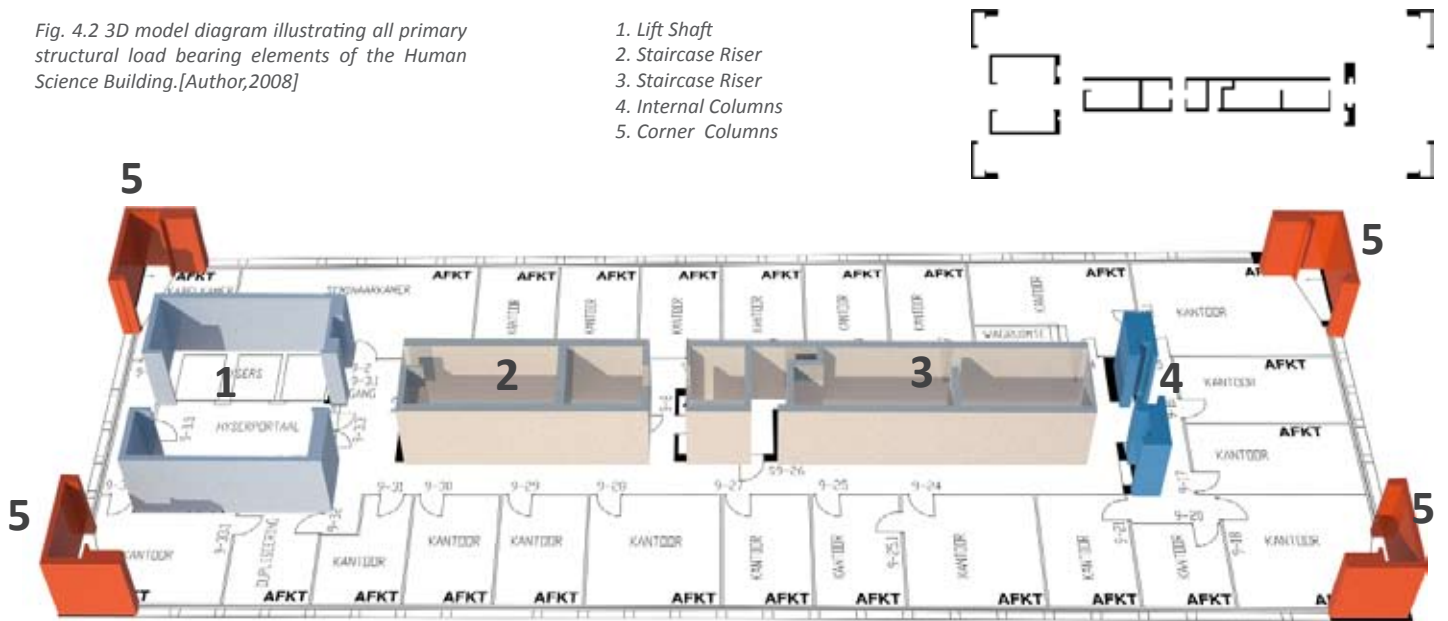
3D model of tower primary load bearing elements superimposed on existing plan drawing from University of Pretoria Technical Services. [Author,2008]
